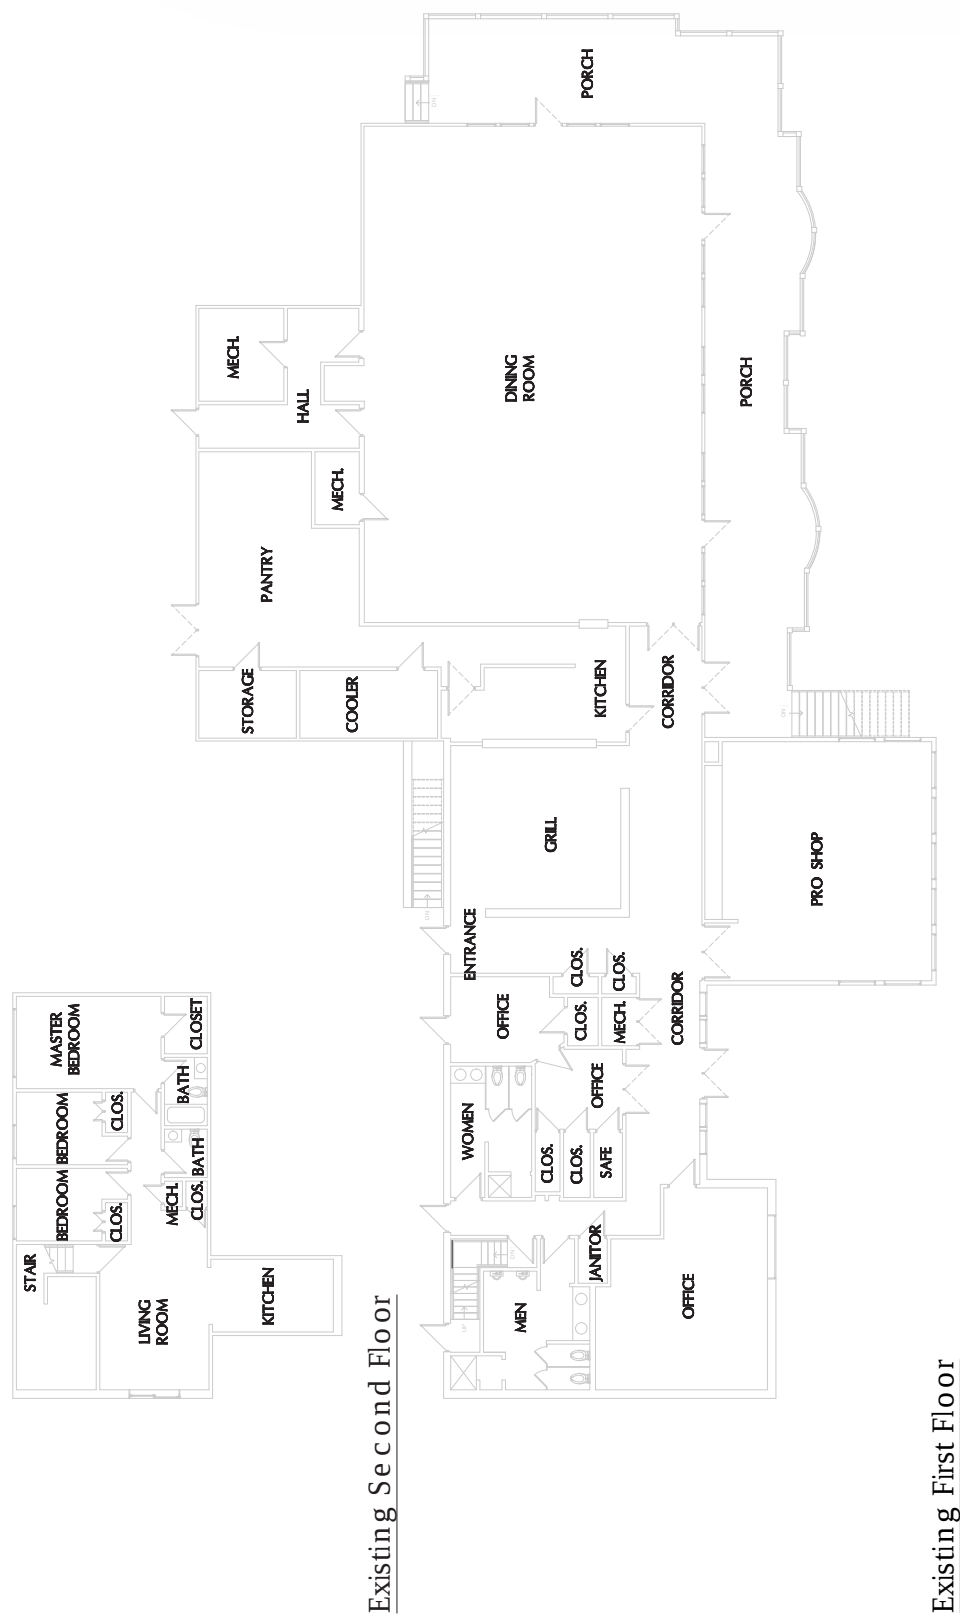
Boone Links Clubhouse Existing First and Second Floor Plans
